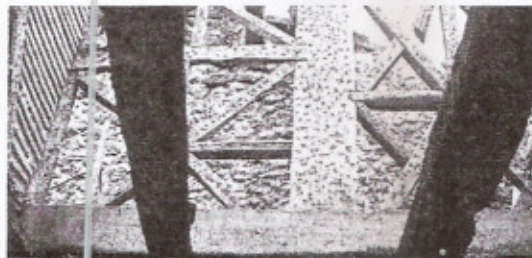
Adobe with timber structure – traditional construction in north of Portugal
